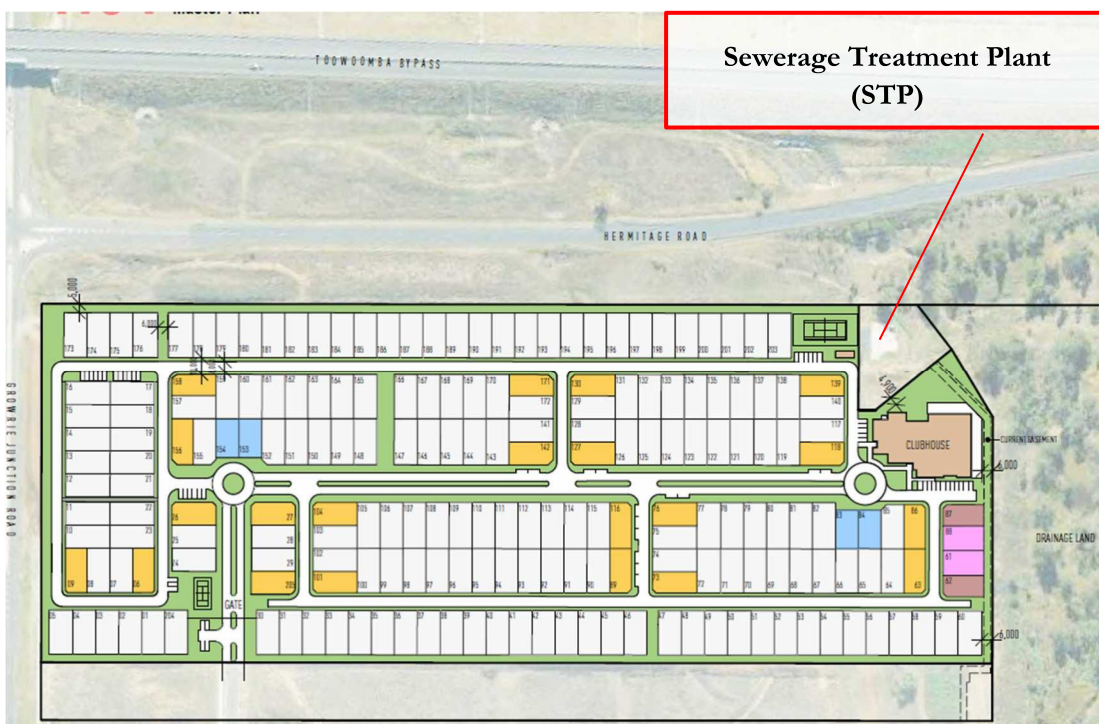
Proposed 205 Lot Residential Subdivision (Appendix A Development Plans)
